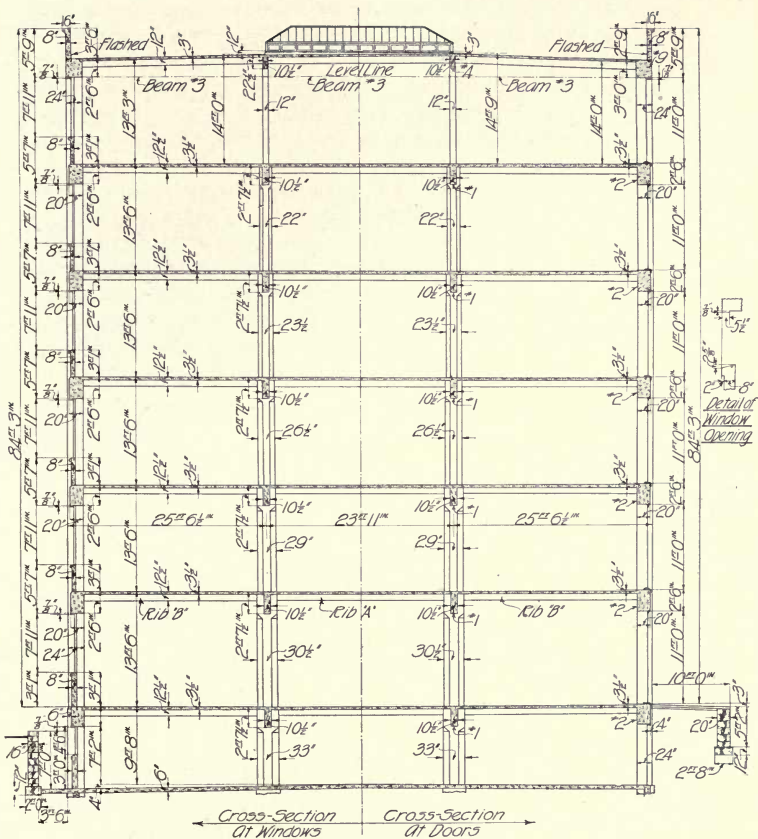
Sectional Elevation of Bush Factory No. 2. (See p. 119.)
